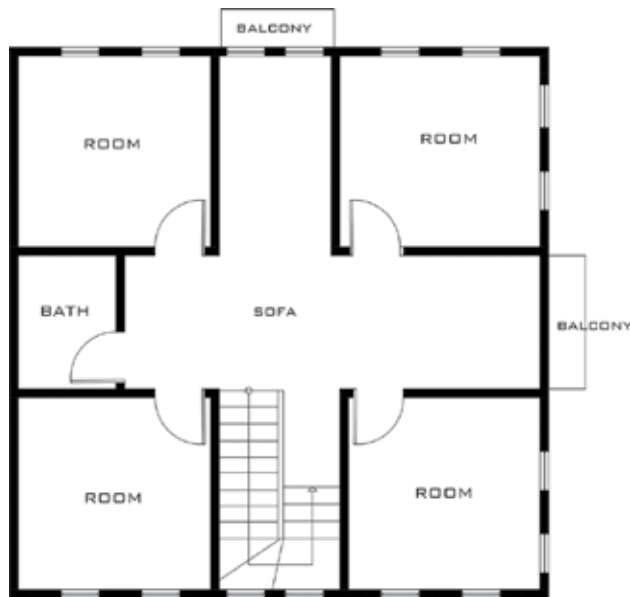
Ground floor plan of Suzan Şimşek house.
